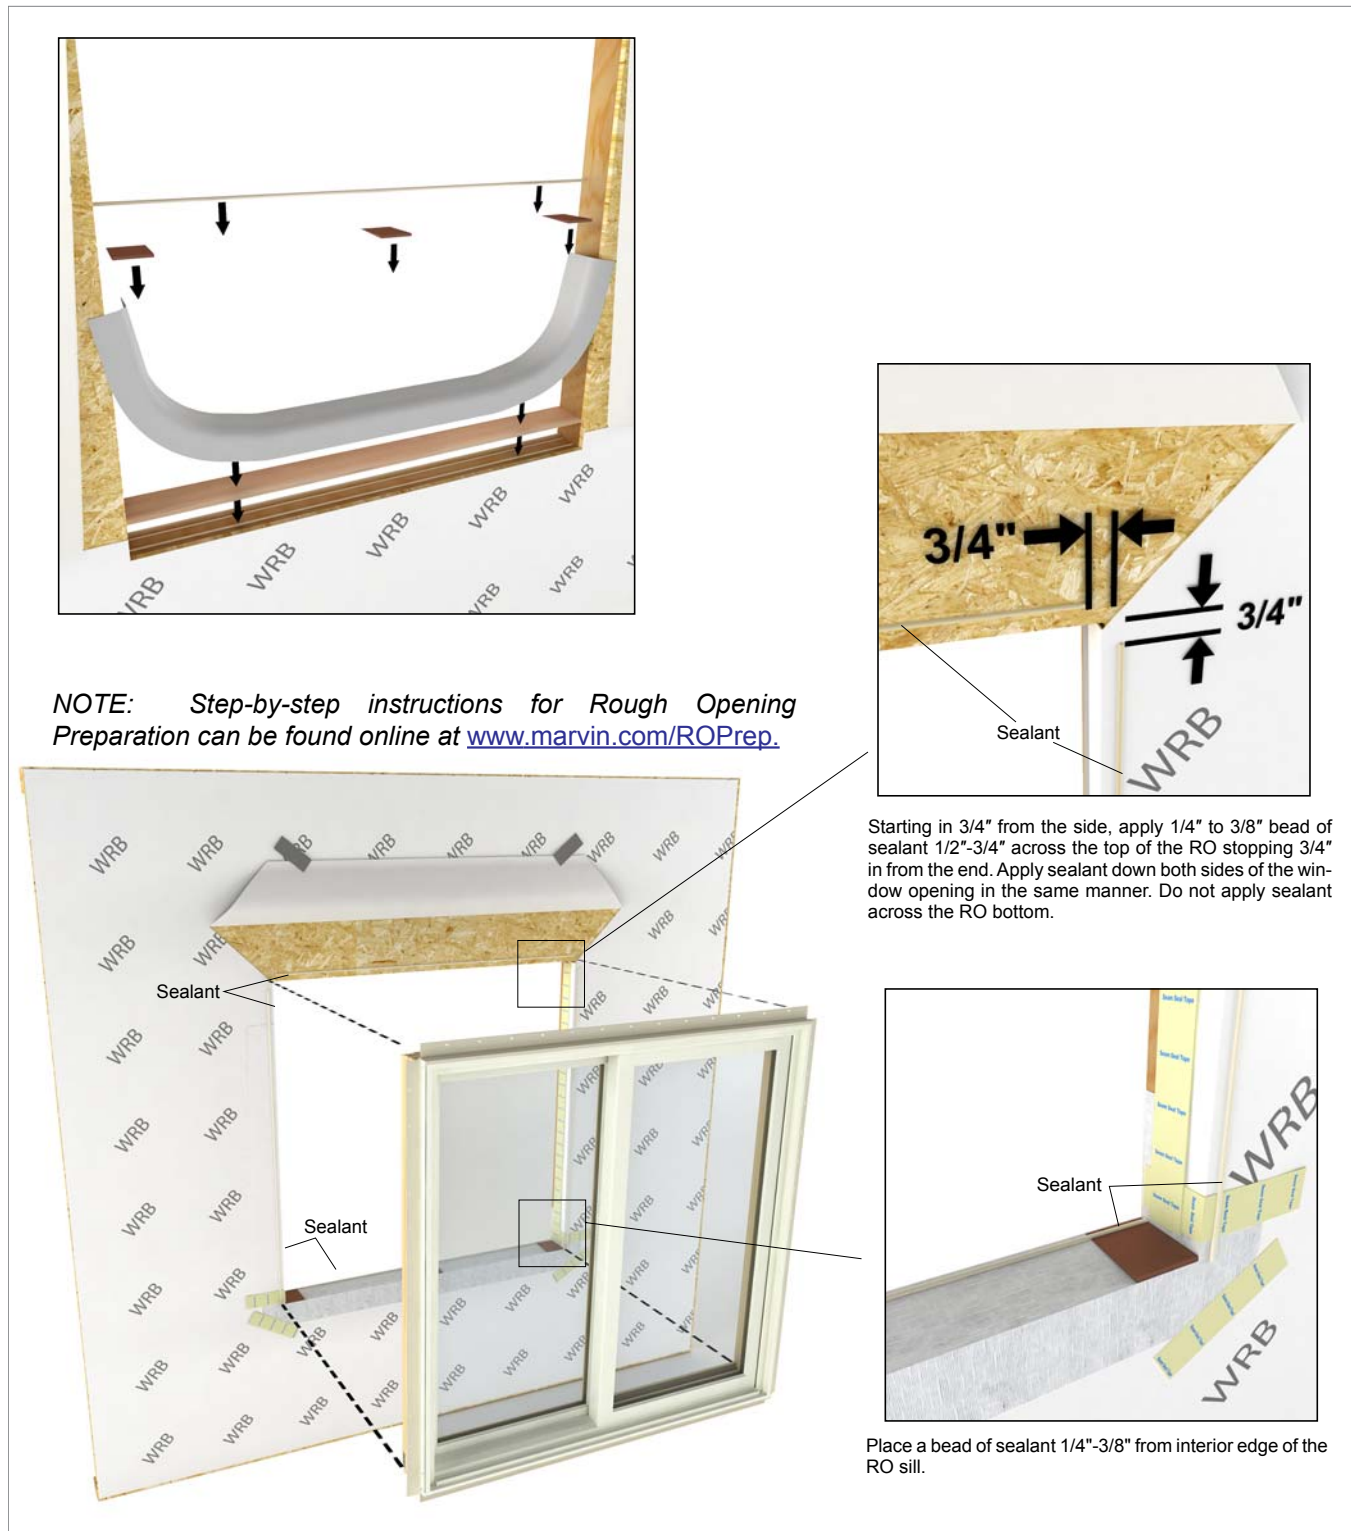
For step by step instructions on how to prepare an opening, refer to www.marvin.com/ROprep.
